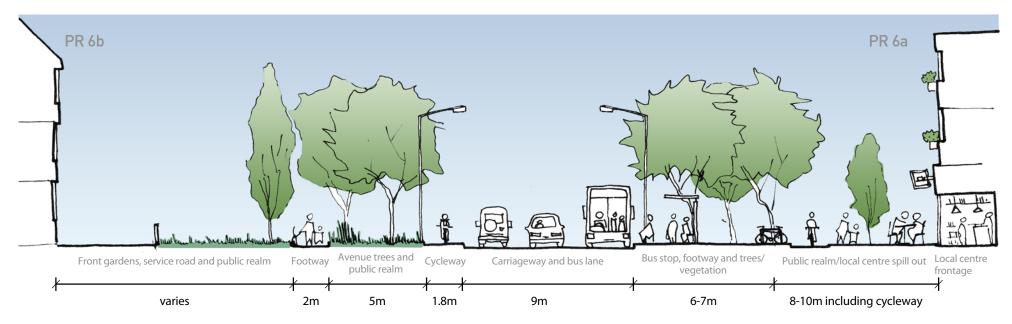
A-A – indicative proposals for improvements to Oxford Road showing relationship to PR6b and PR6b frontages (subject to final Oxford Road design by OCC).
